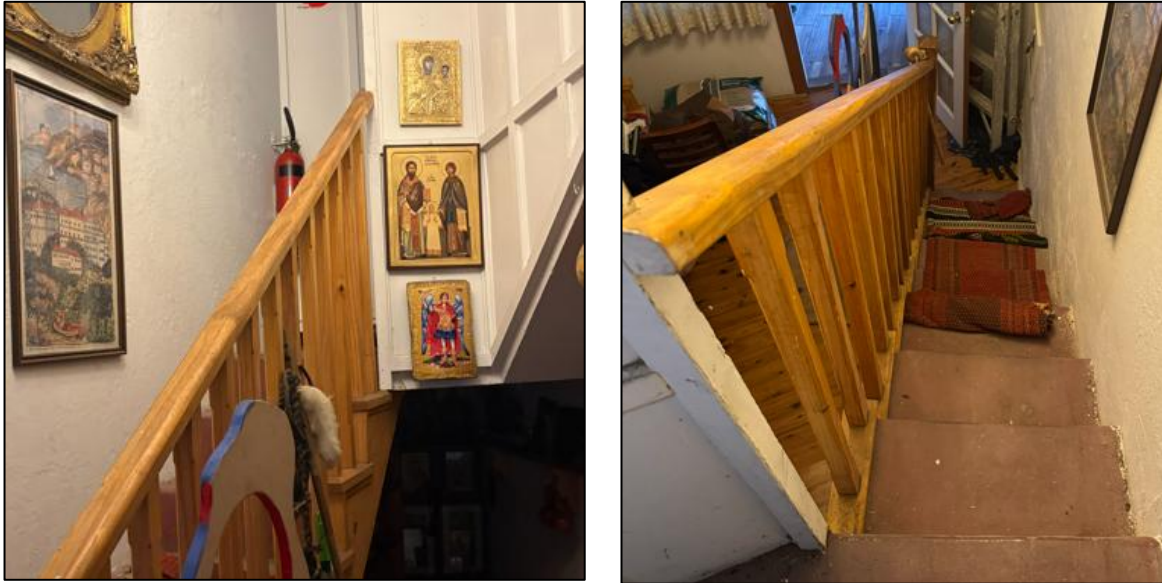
View of the staircase room that provides access to the former gallery and projection room on the first floor.
